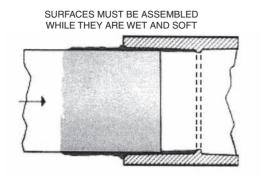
B: Cement coatings of sufficient thickness. Joint surfaces must be assembled while surfaces are wet and soft. Courtesy NIBCO, Inc.
